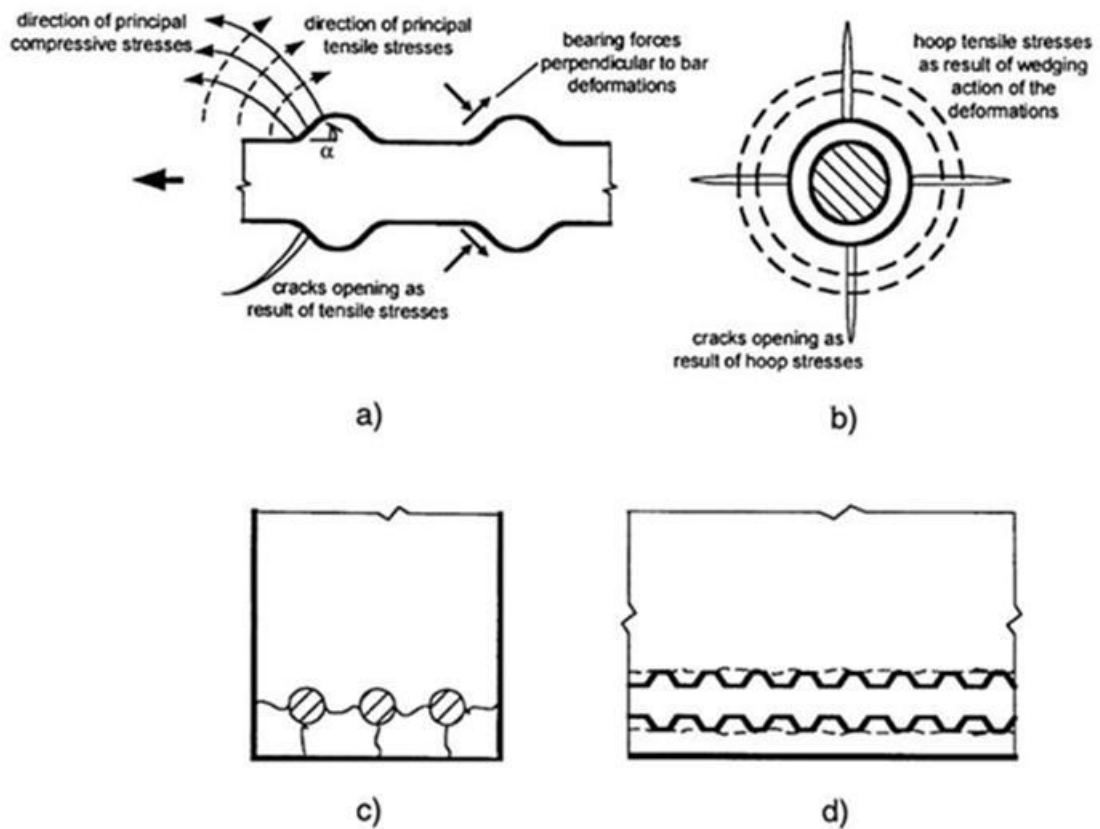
Cracking and damage mechanisms in bond: a) side view of a deformed bar with deformation face angle α showing formation of cracks, b) end view showing formation of splitting cracks parallel to the bar, c) end view of a member showing splitting cracks between bars and through the concrete cover, and d) side view of member showing shear crack and/or local concrete crushing due to bar pullout (ACI committee 408, 2003)
